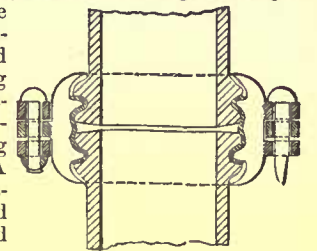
Divided-Ring Sleeve-joint with double Bolt.
